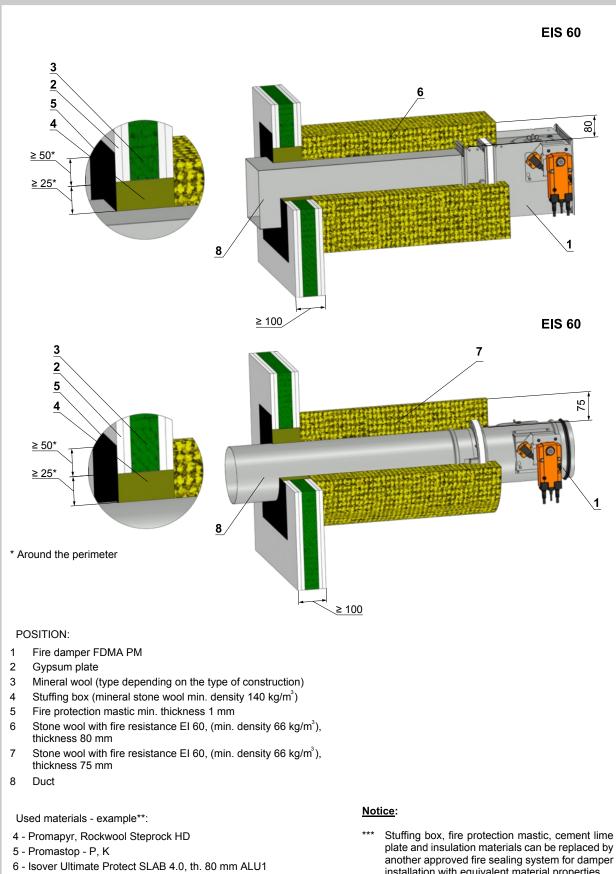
Installation outside of gypsum wall construction - mineral wool - stone wool - fire protection mastic
